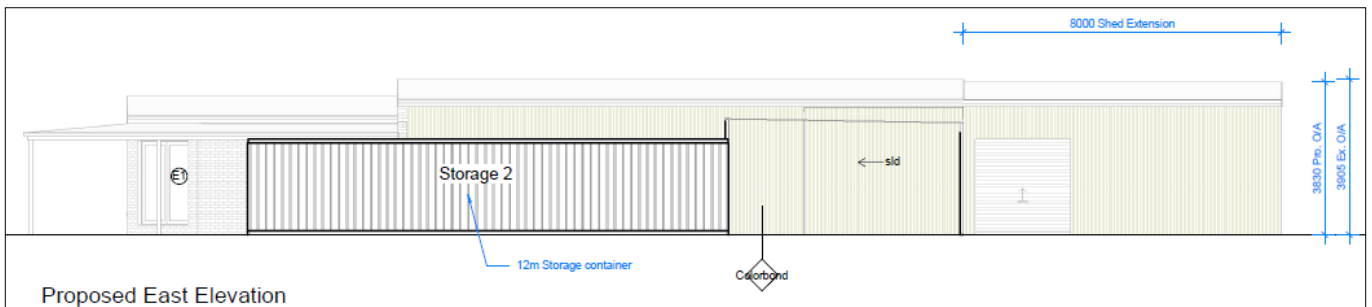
Proposed East Elevation, as viewed from Timothy Lane
